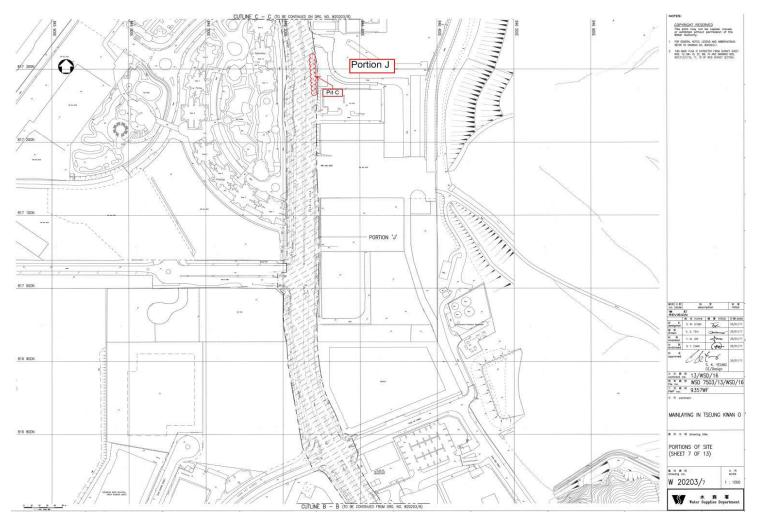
Location Plan for Portion J – CH.A 19+15 to CH.A 19+50 (Pit C)
